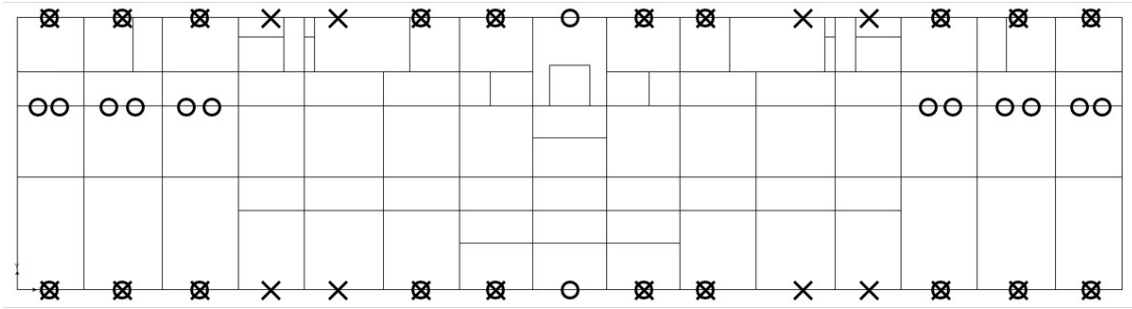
Damper Placement at 2nd floor (SR-X); ODAM: 12 dampers
